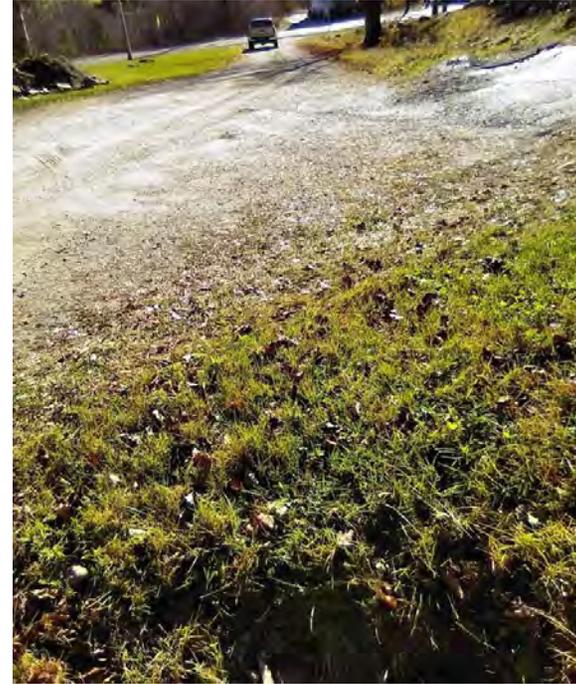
Segment 22134 lacks proper ditching and culvert 101 is plugged, causing water to run along the road surface.
